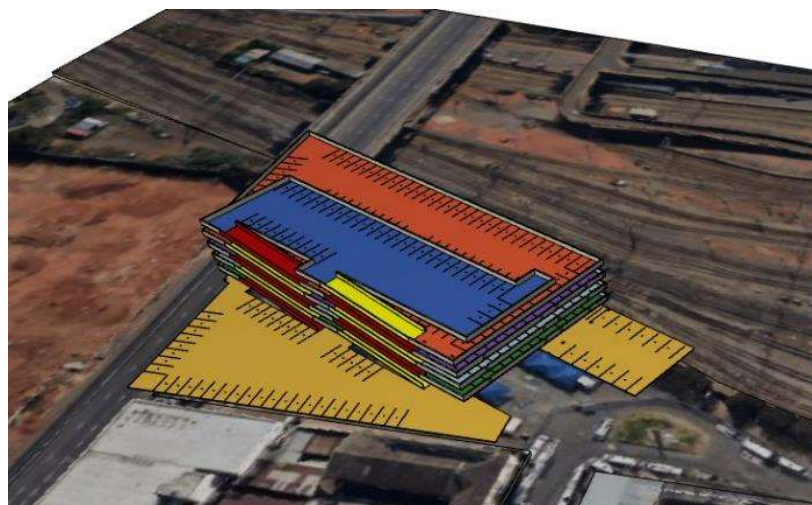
New multi-storey parkade concept to be developed on existing shaded parking site
